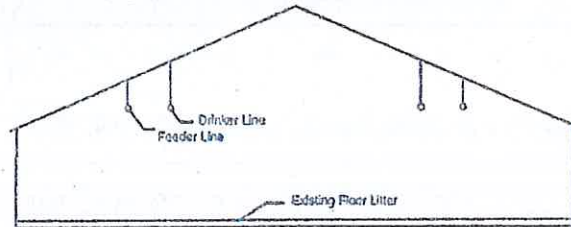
Cross-section of broiler house with feeder and drinker lines raised to ceiling.
